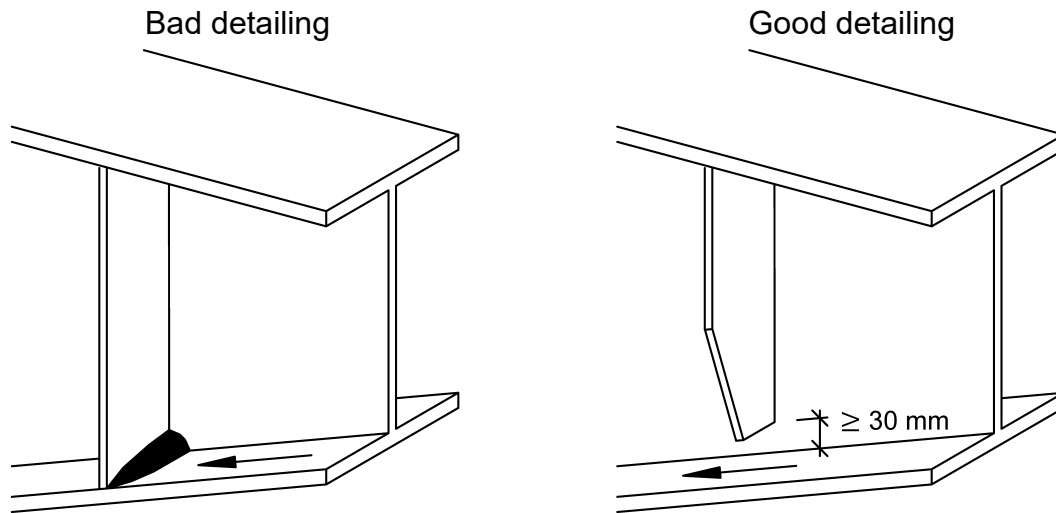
Curtailing transverse web stiffeners to allow drainage below
